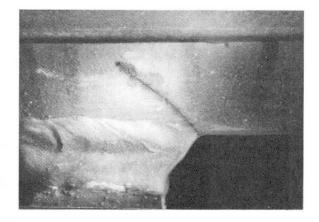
Typical crack in the centerbeam at the full-penetration weld connection.
